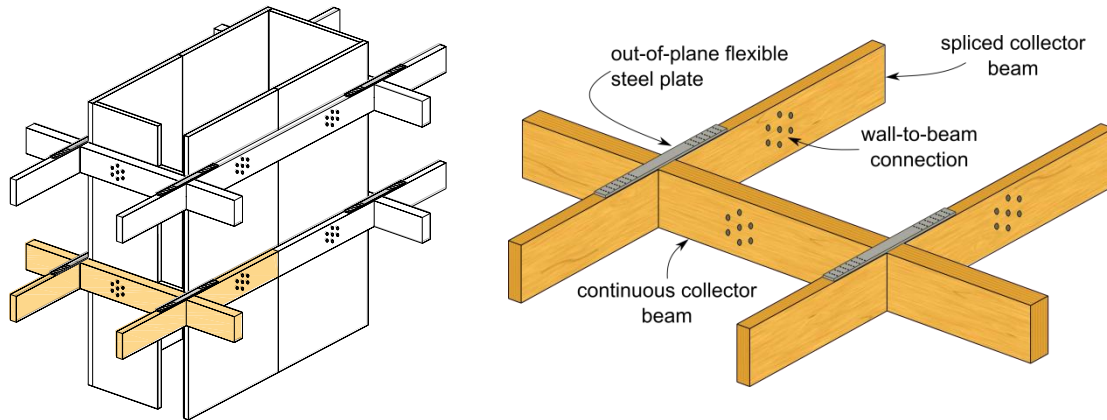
Collector beam connection with out-of-plane flexible steel plates
